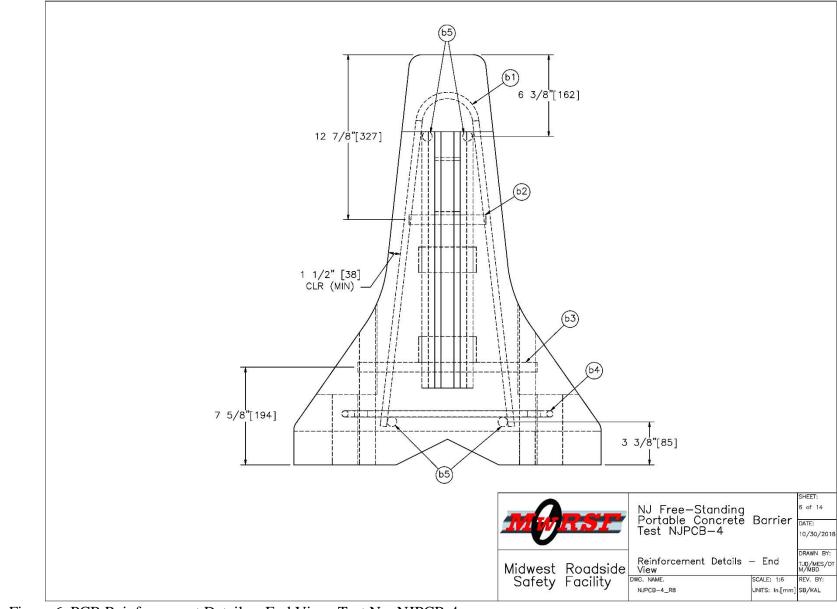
PCB Reinforcement Details – End View, Test No. NJPCB-4
